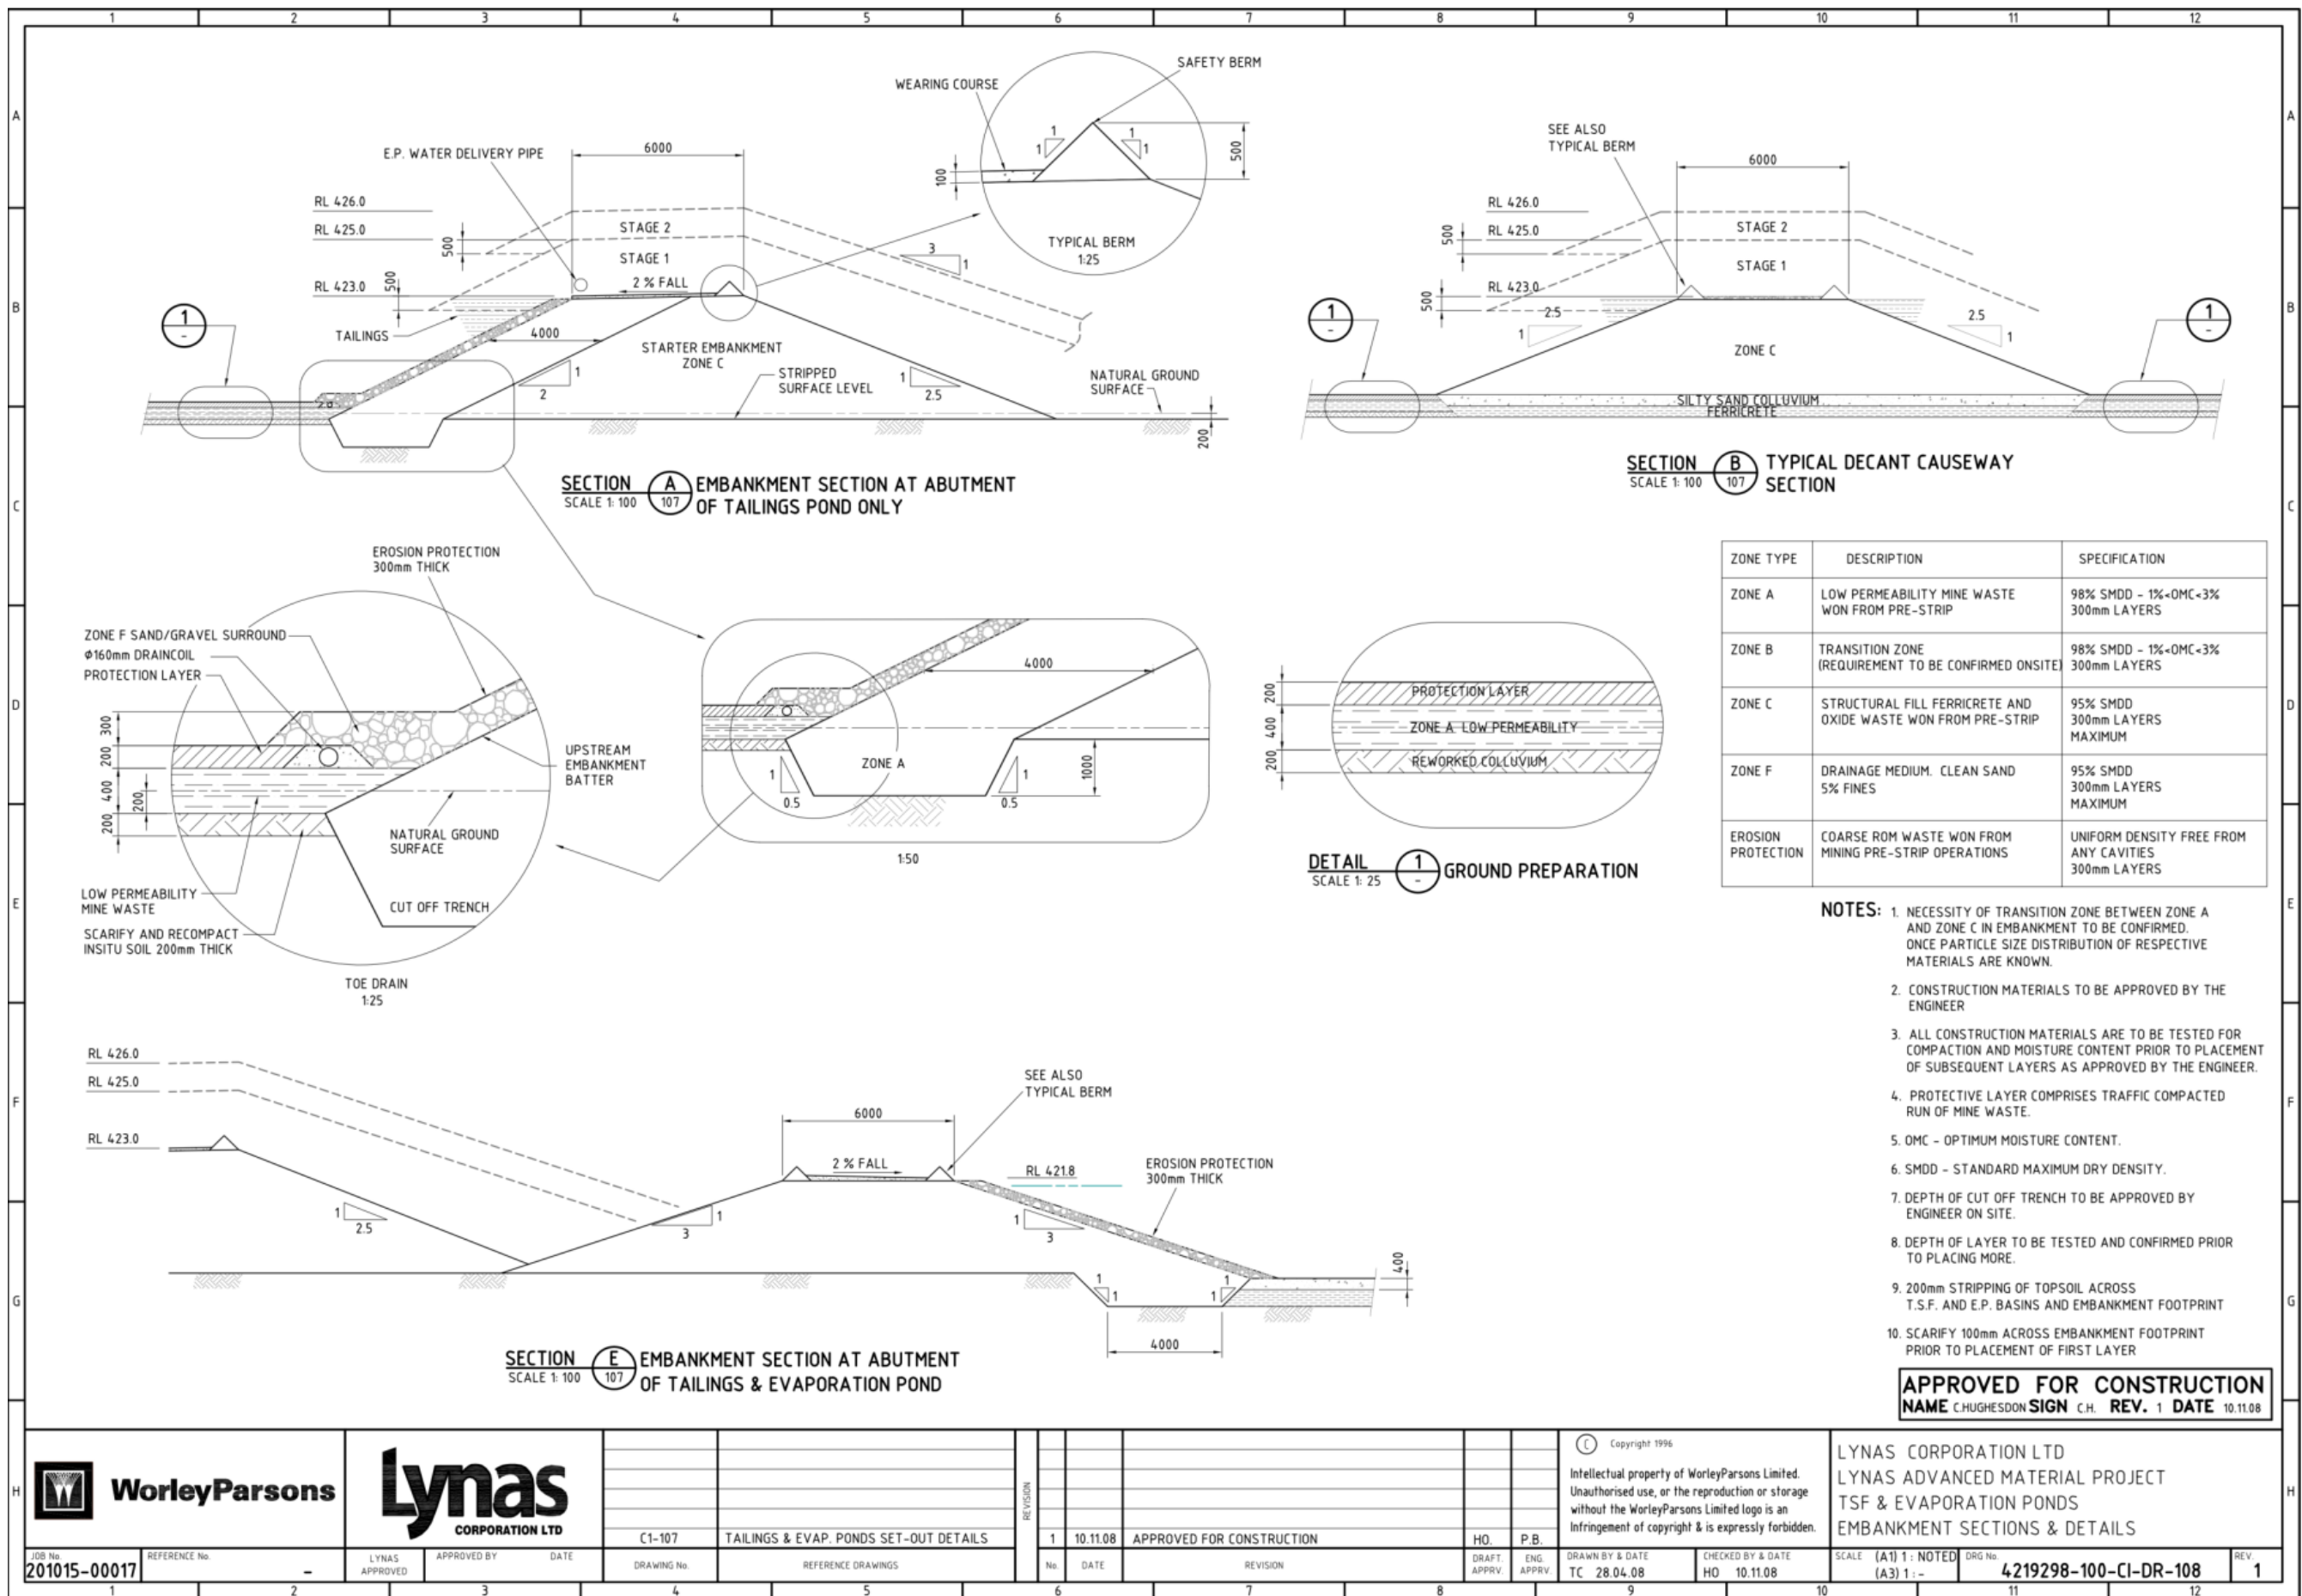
Tailings Storage Facility 1 Embankment Design
